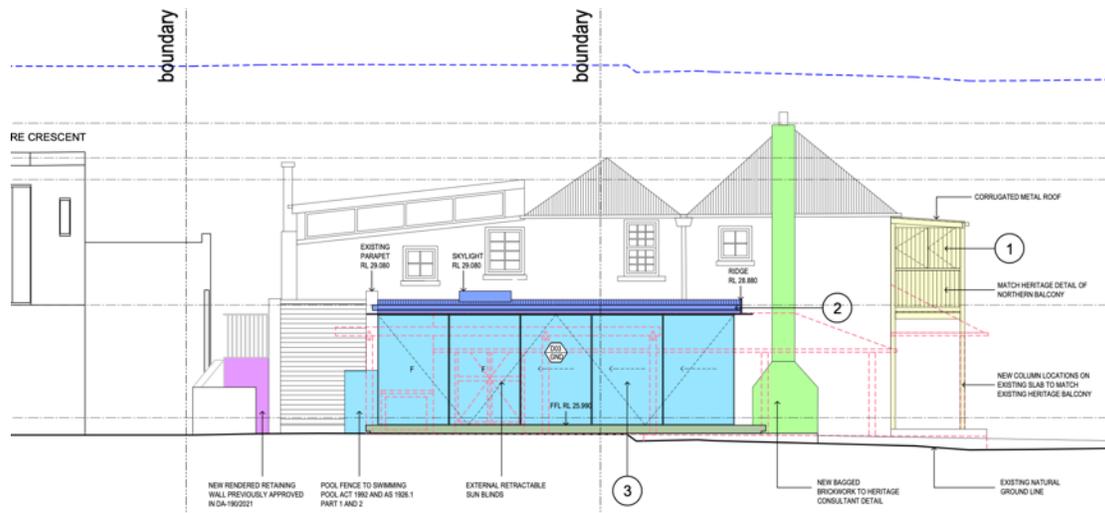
, Proposed western elevation with new pavilion, *Michael Cumming Architect*, 24.02.23
